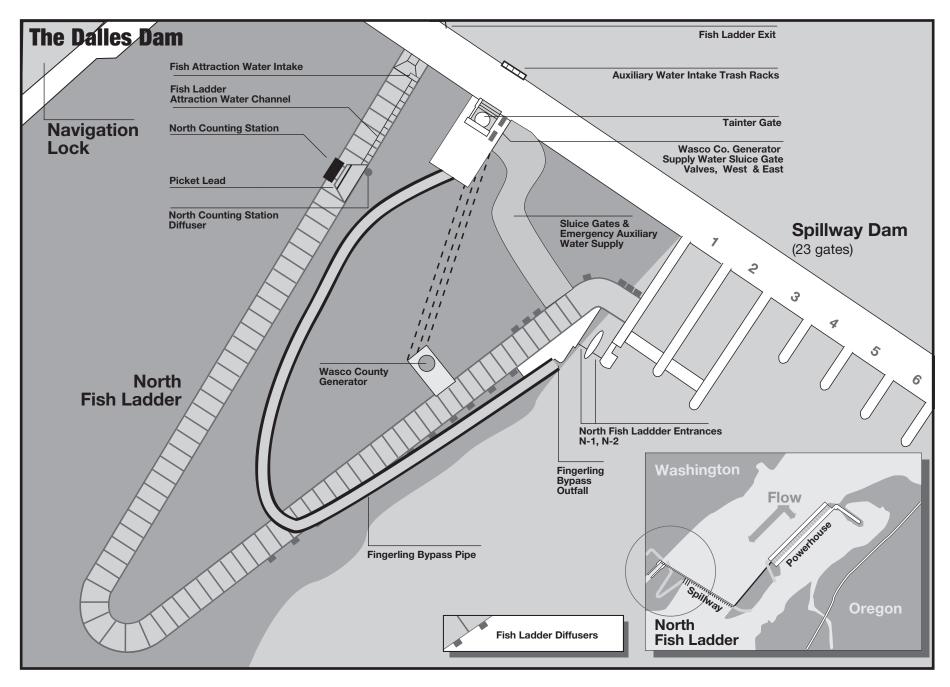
The Dalles Dam North Fish Ladder and Spillway.
